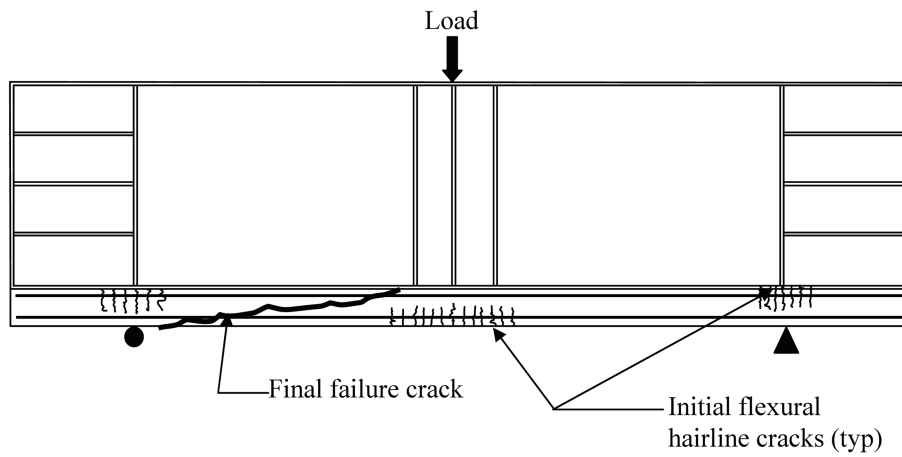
Typical crack pattern observed in girder CPG5
